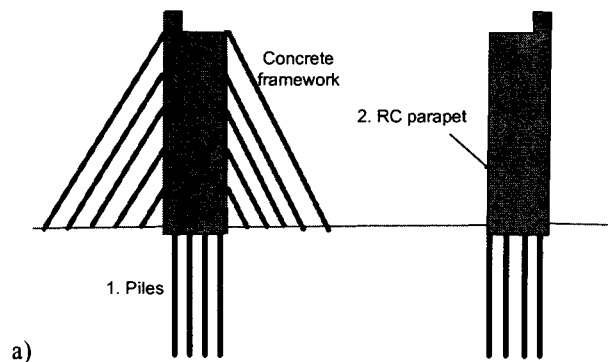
(left) Inherent problems with cantilever type retaining walls.
